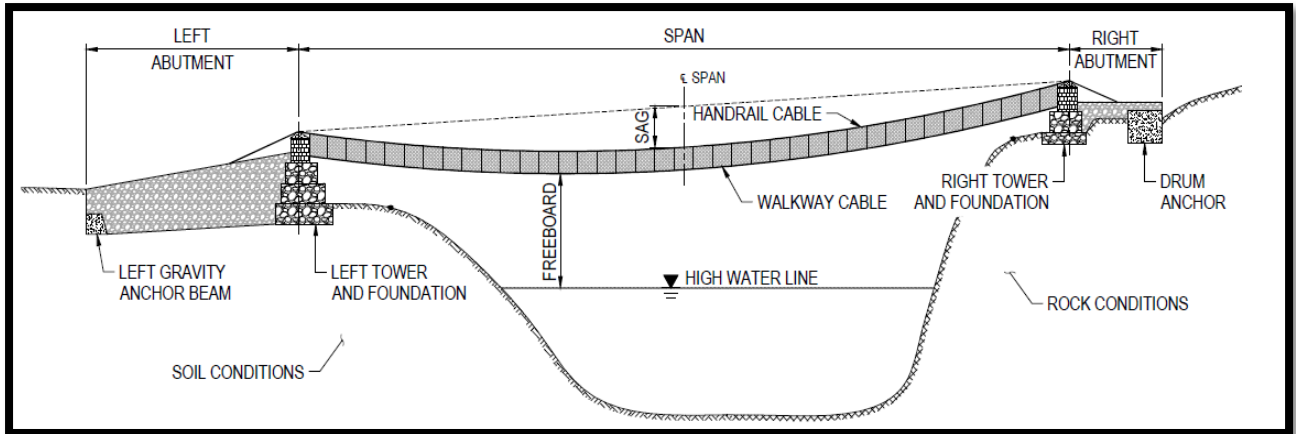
Cable suspended Pedestrian bridge typical Elevation View [6].
